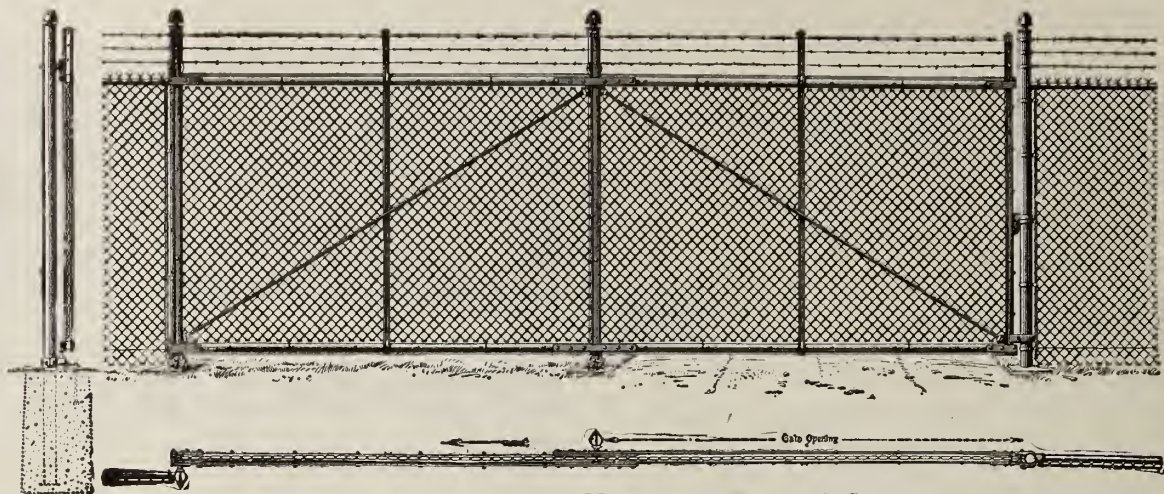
ELECTRICALLY WELDED SLIDING GATE
